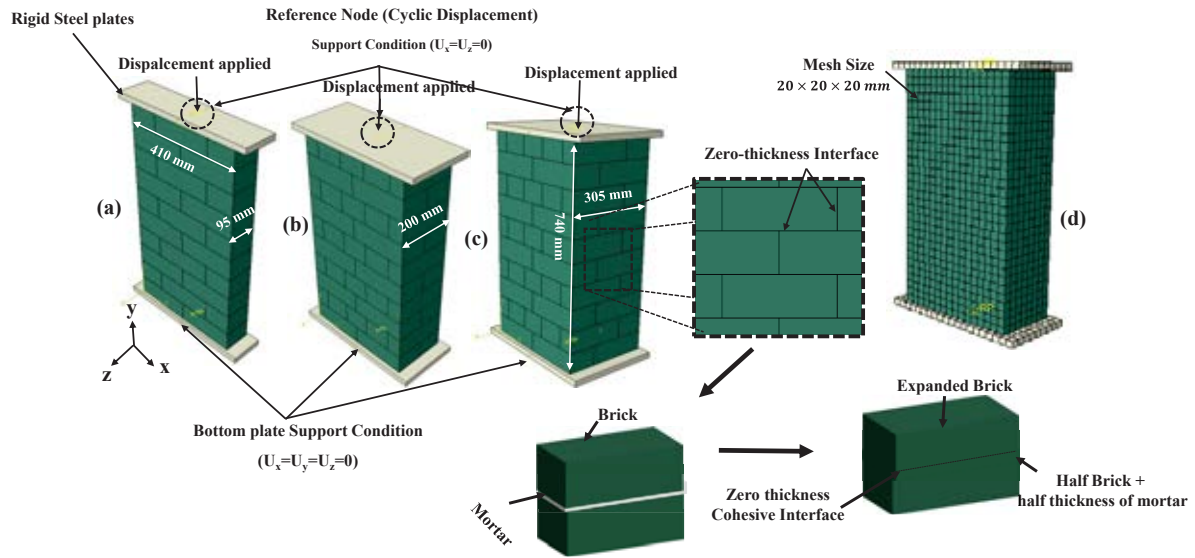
Wallettes model details (a) Single brick (b) Double brick (c) Triple brick with detail of expanded bricks and (d) Mesh size
